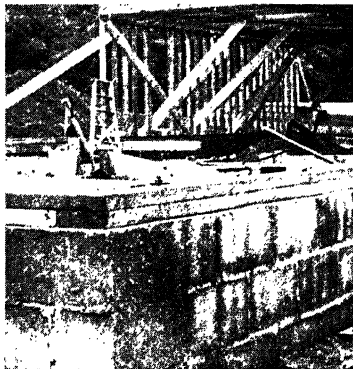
B.—The right way. The top of the foundation is level, forming a solid bearing for walls, and preventing air leaks. (Courtesy of Alexander Houses, Inc.)
